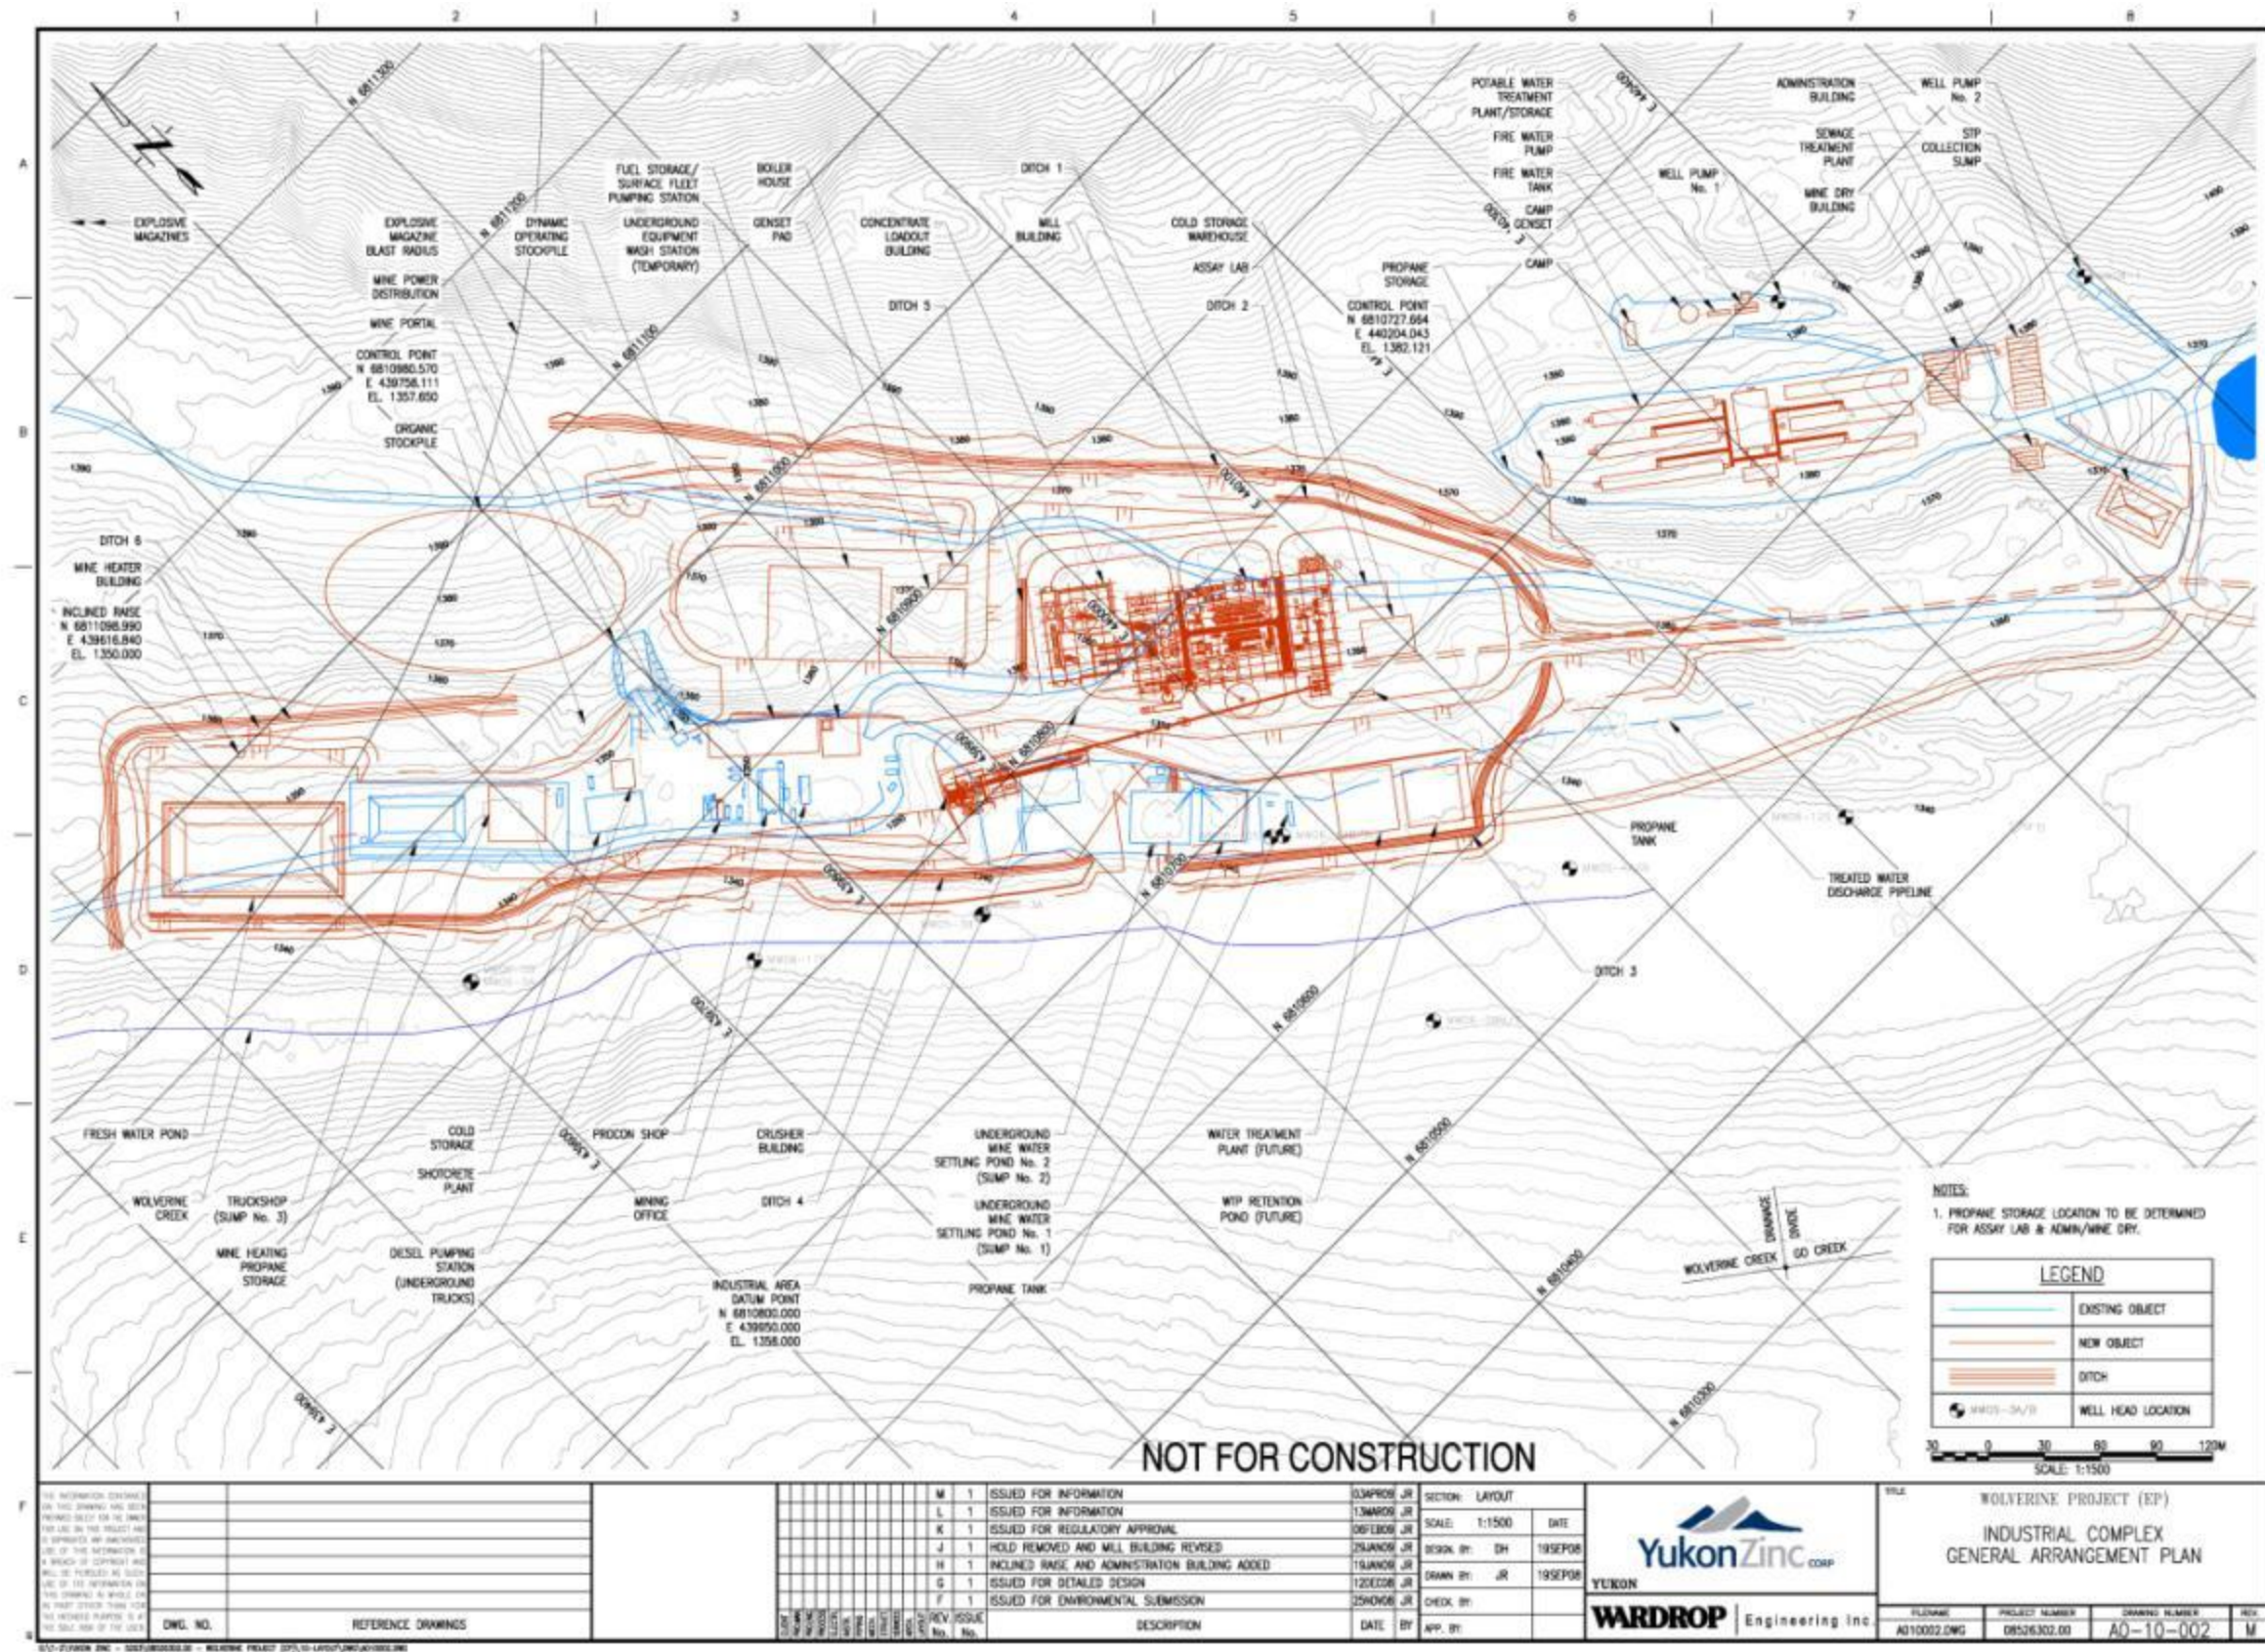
Existing and Future Industrial Complex Layout with the Mill Bypass Road Shown at Right
